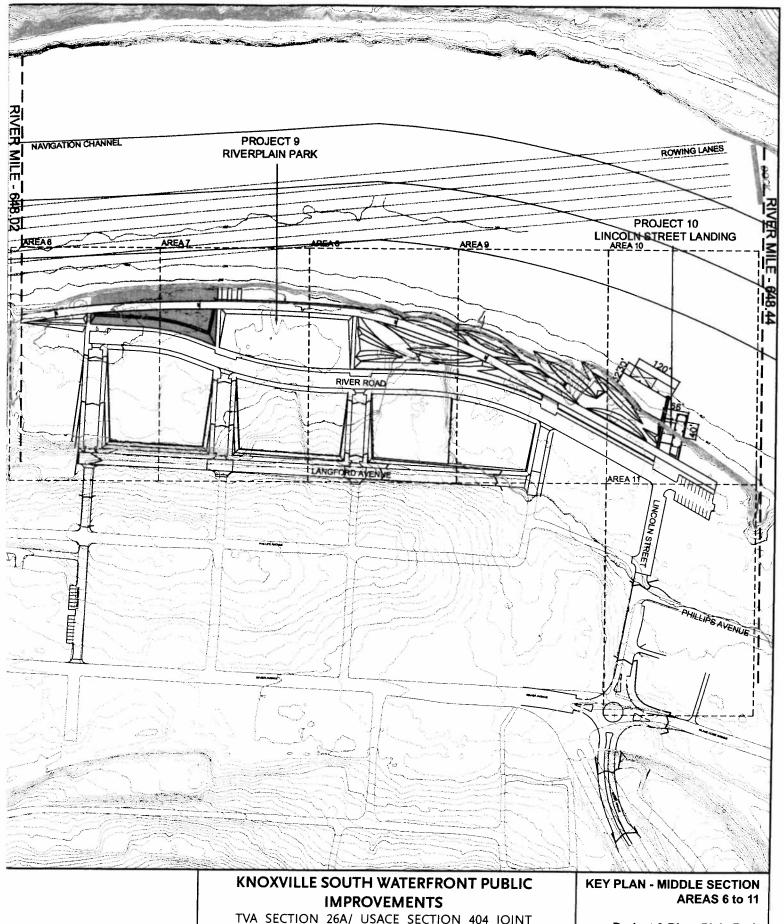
EXHIBIT D FILE NO. 200800886 P.N. NO. 08-51 TVA SECTION 26A/ USACE SECTION 404 JOINT PERMIT APPLICATION
